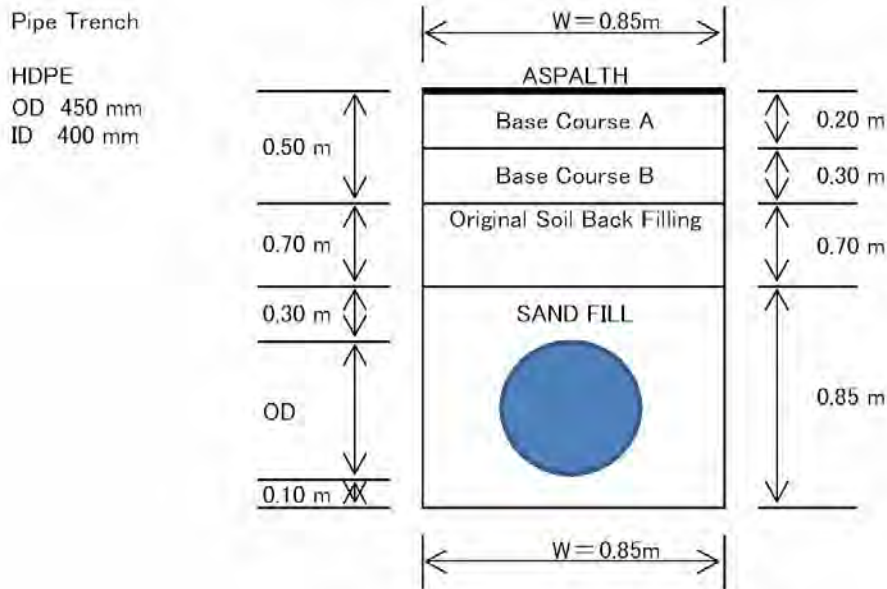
a.2 Standard Section of Pipe Earthwork for the General Open Cut Method Part
